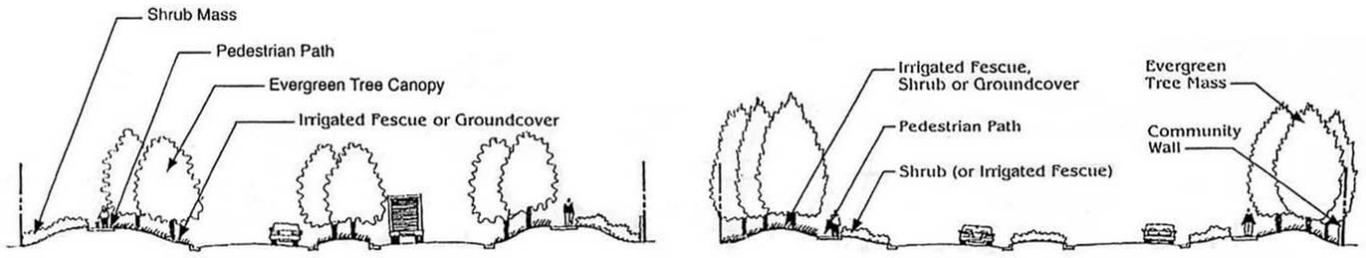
TYPICAL GRANT LINE ROAD LANDSCAPE CROSS SECTION C-C
